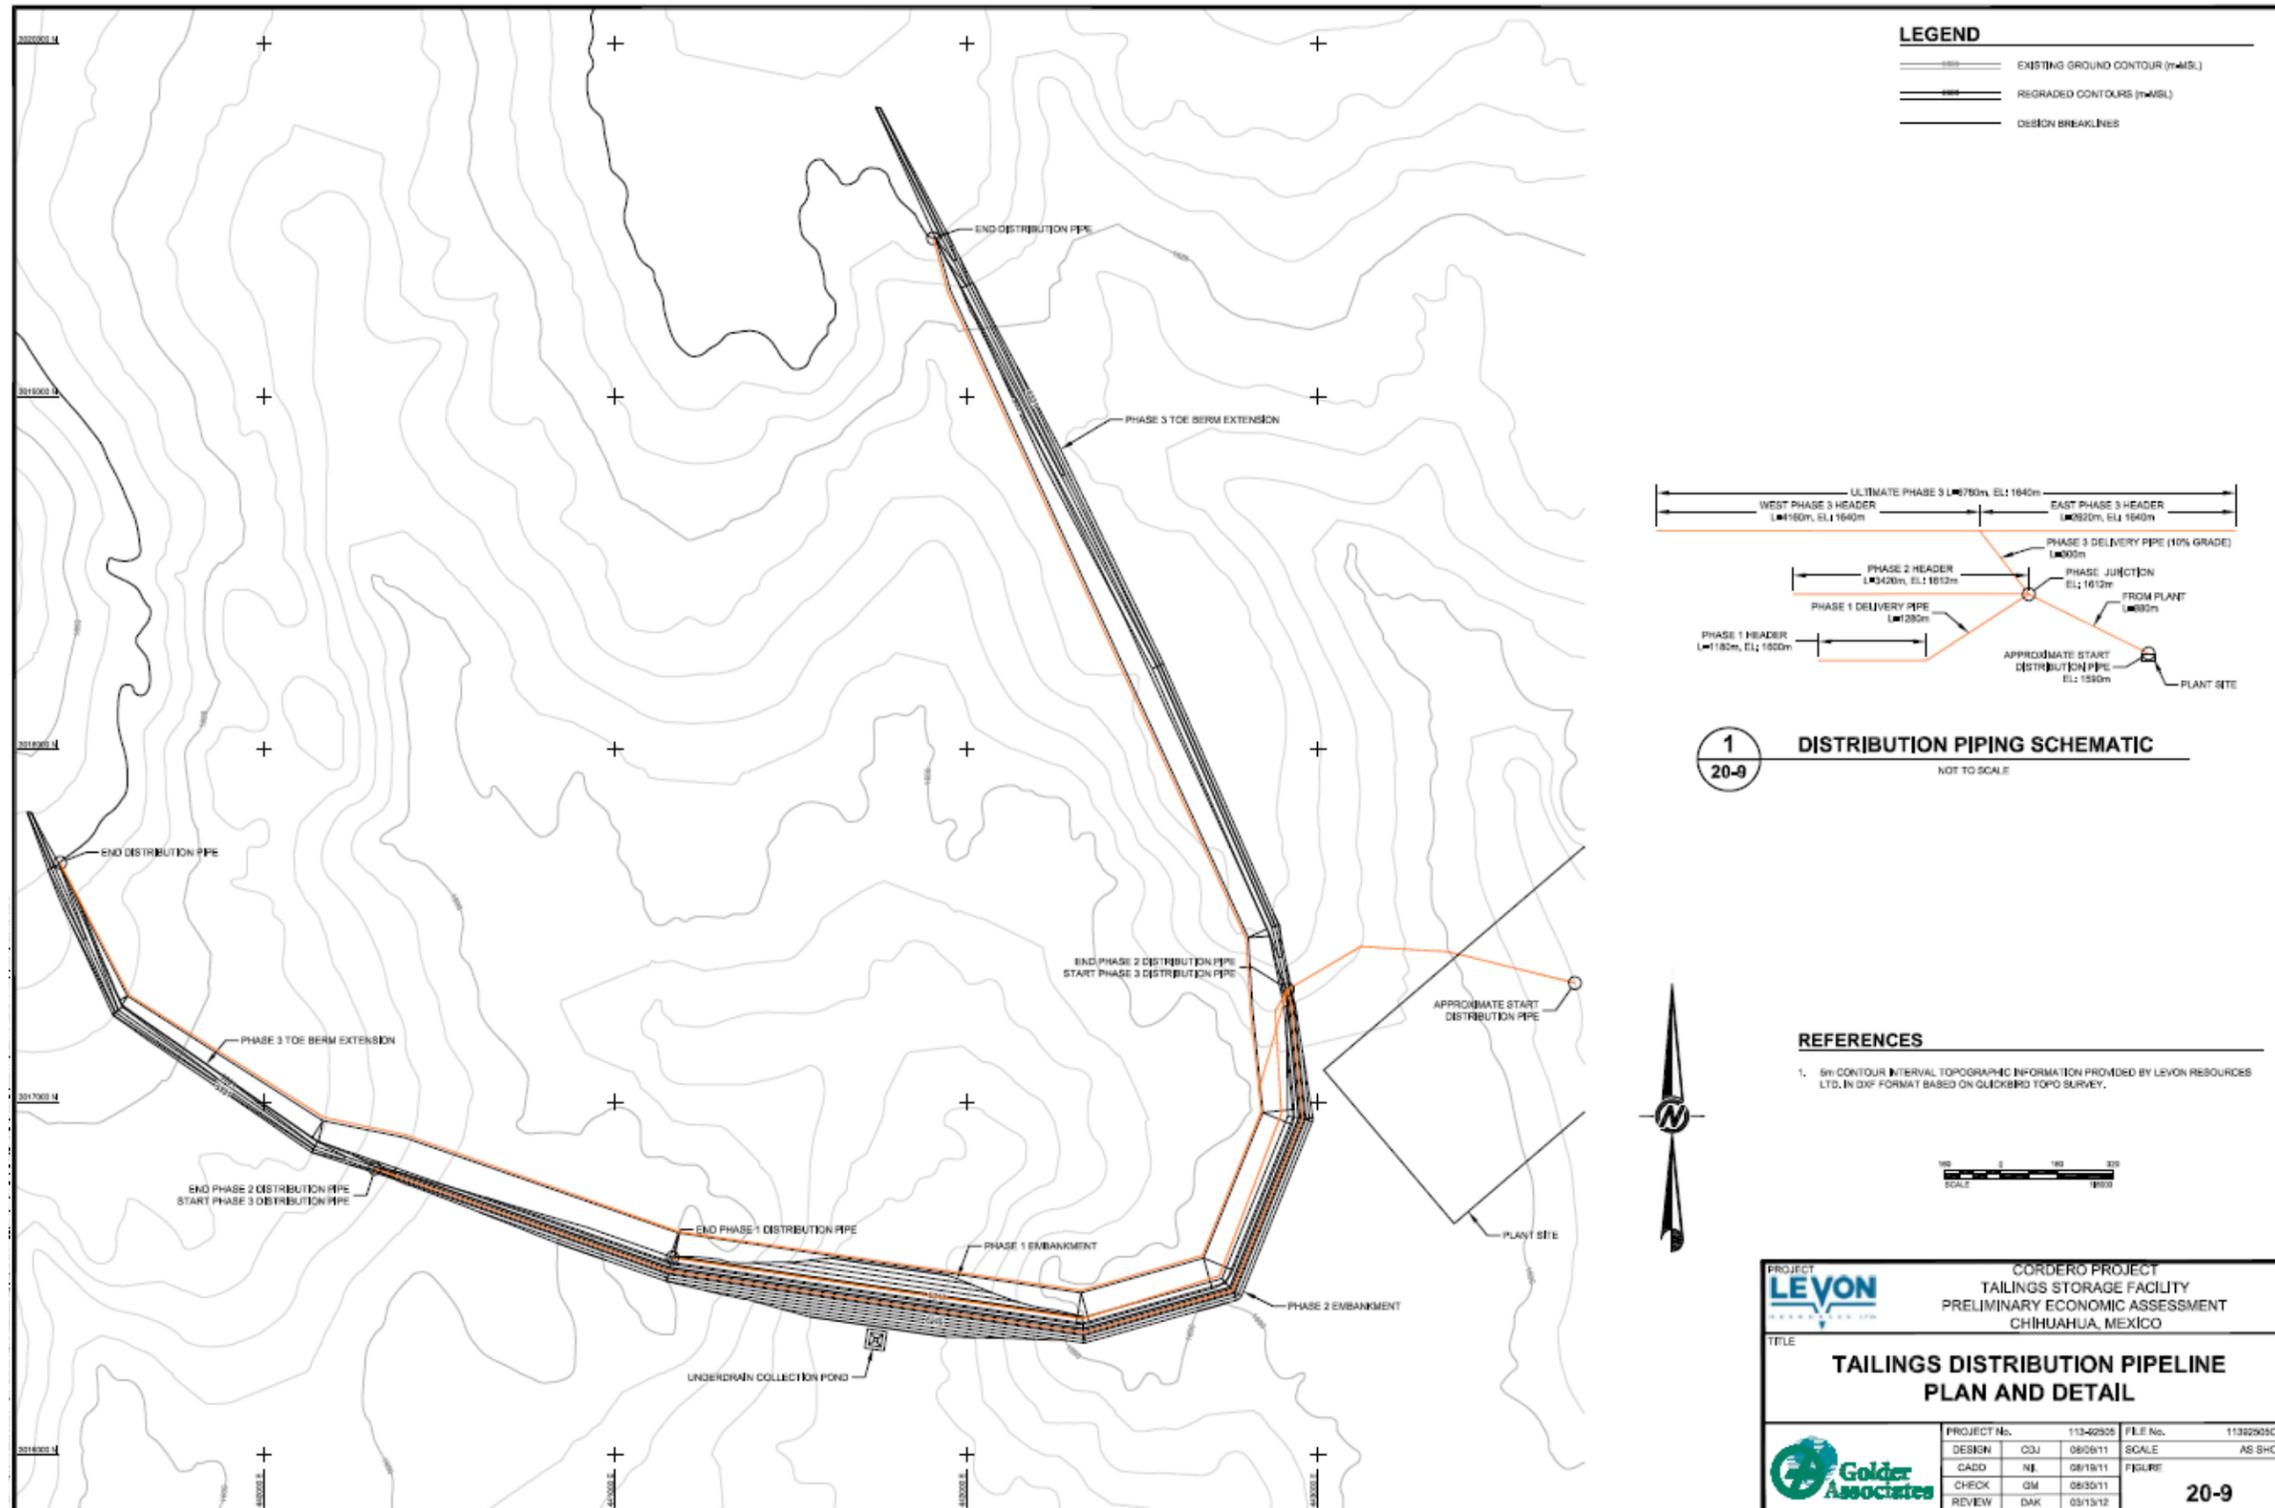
Tailings Distribution Pipeline Plan and Detail
